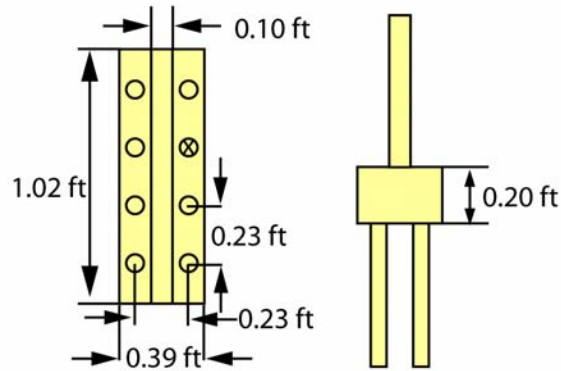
Plan and elevation view of model complex pier 1 (Type A, All dimensions are in feet).
